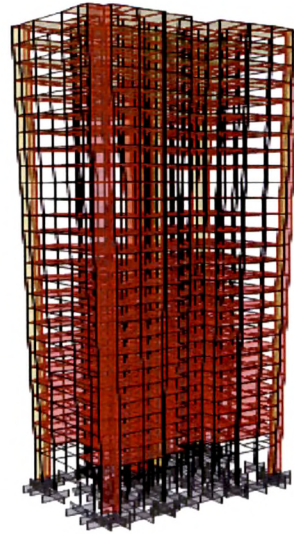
Frame System with Shear Core    Fig. 7.19 Bracing System (At Corners)
